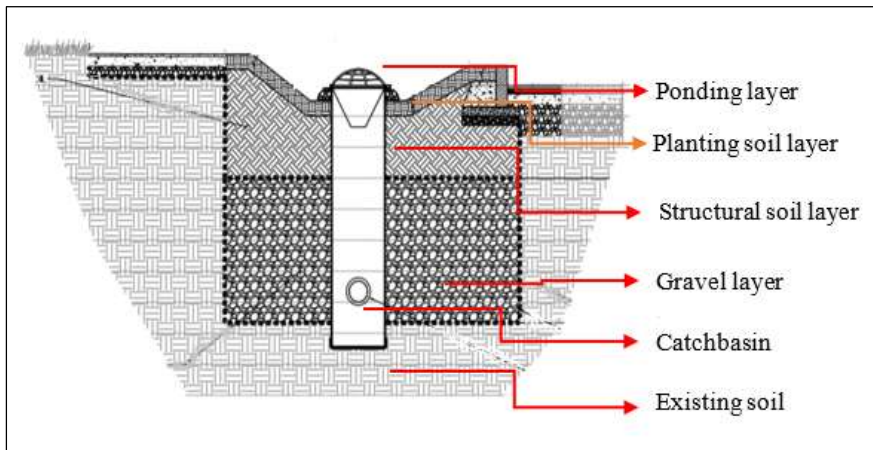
Schematic diagram of a typical STR infiltration trench (CH2MHILL)
